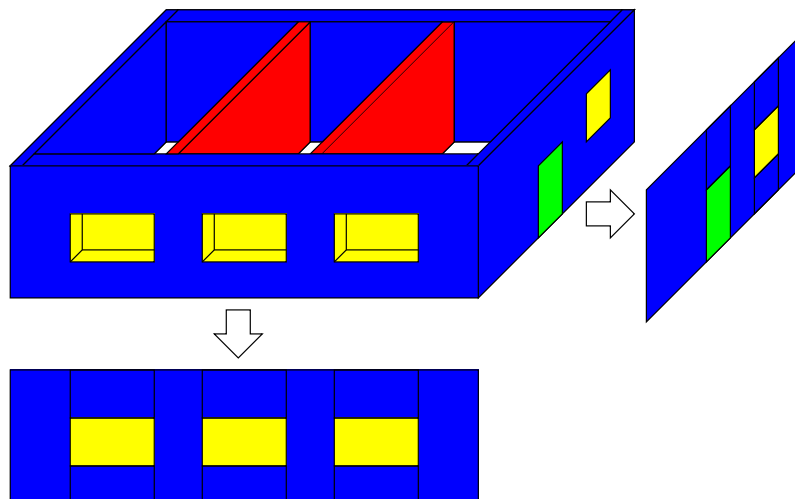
A building is made up of floors, stories, rooms and convex spaces.
